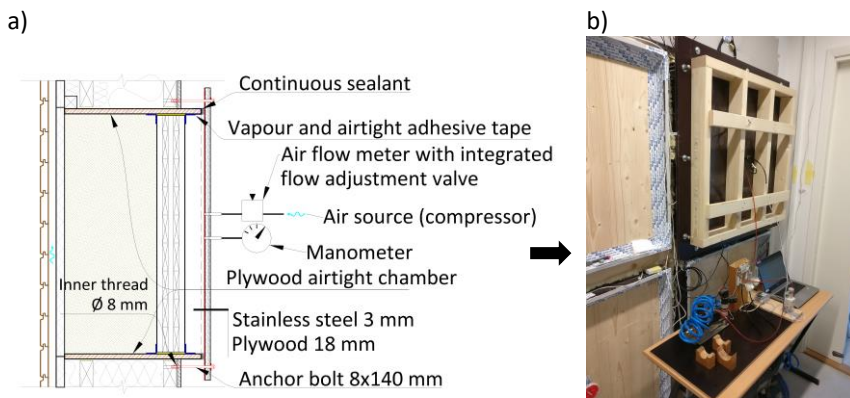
Equipment kit scheme for the air permeability test of CLT test walls (a) and performing an air permeability test (b).
